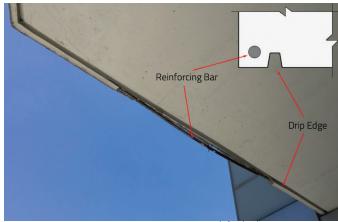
Concrete spalled from a balcony, exposing a reinforcing bar
